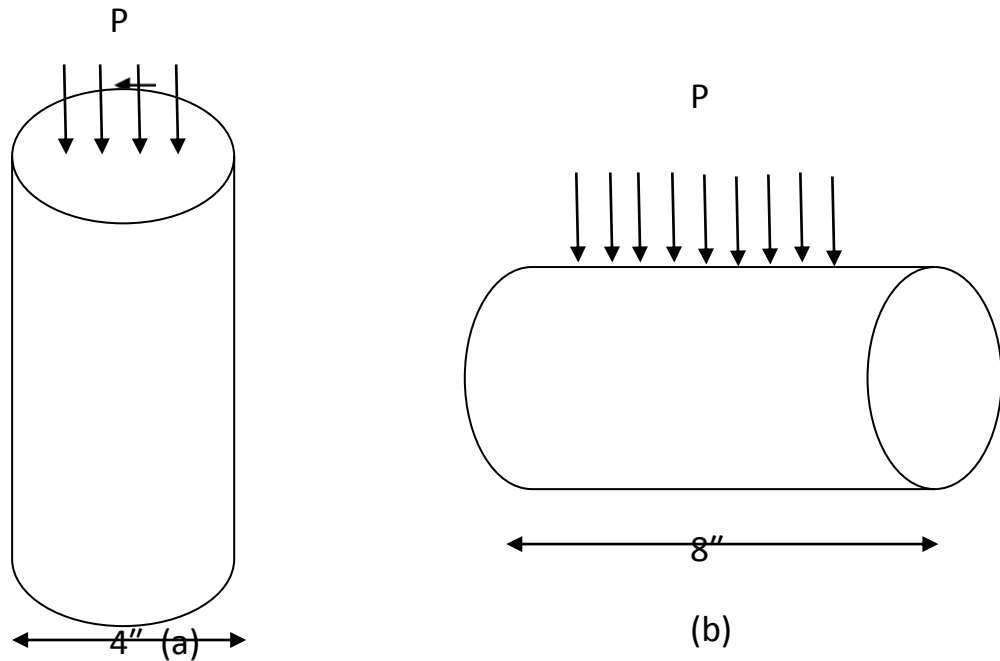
Typical dimension of cylinder specimen (a) compressive strength test and (b) tensile strength test
